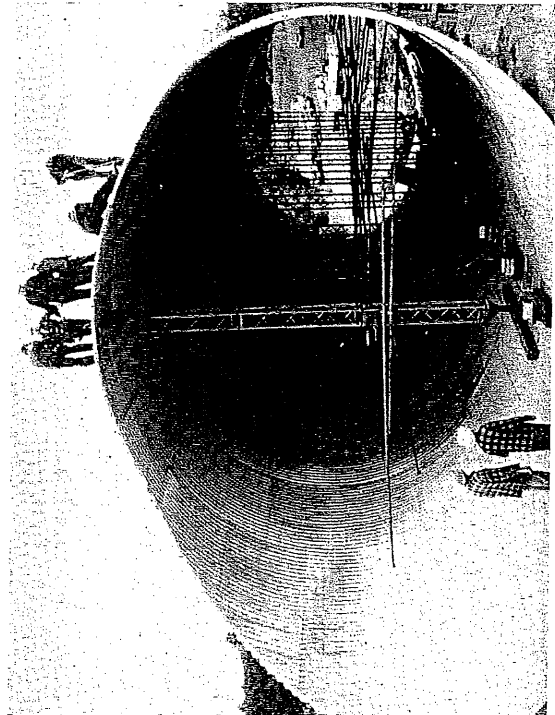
Tightening bolts on a long span structural plate culvert. Research underpass is fully instrumented prior to back filling.
